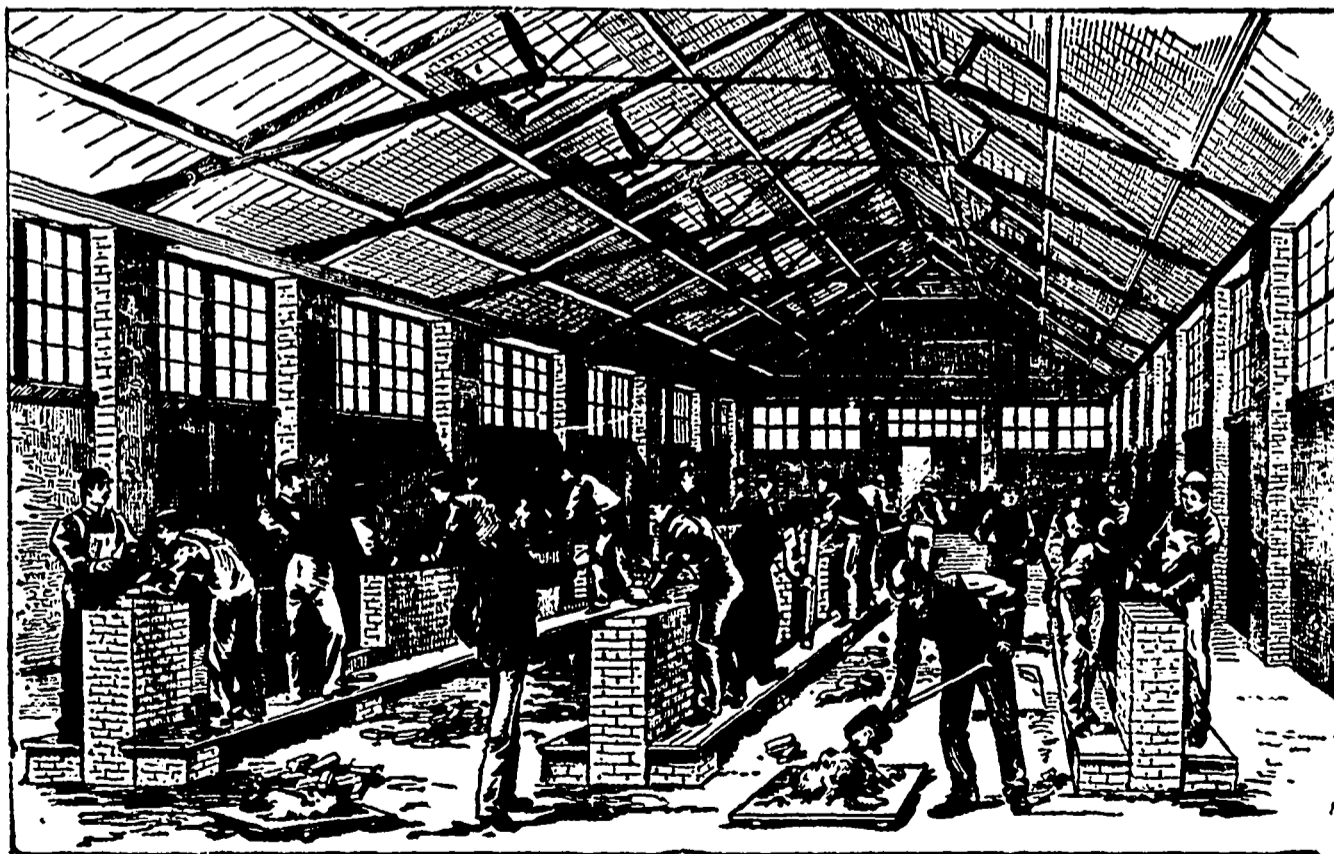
BRICKLAYING ROOM—BUILT BY BRICKLAYING CLASS, 1883-84.
